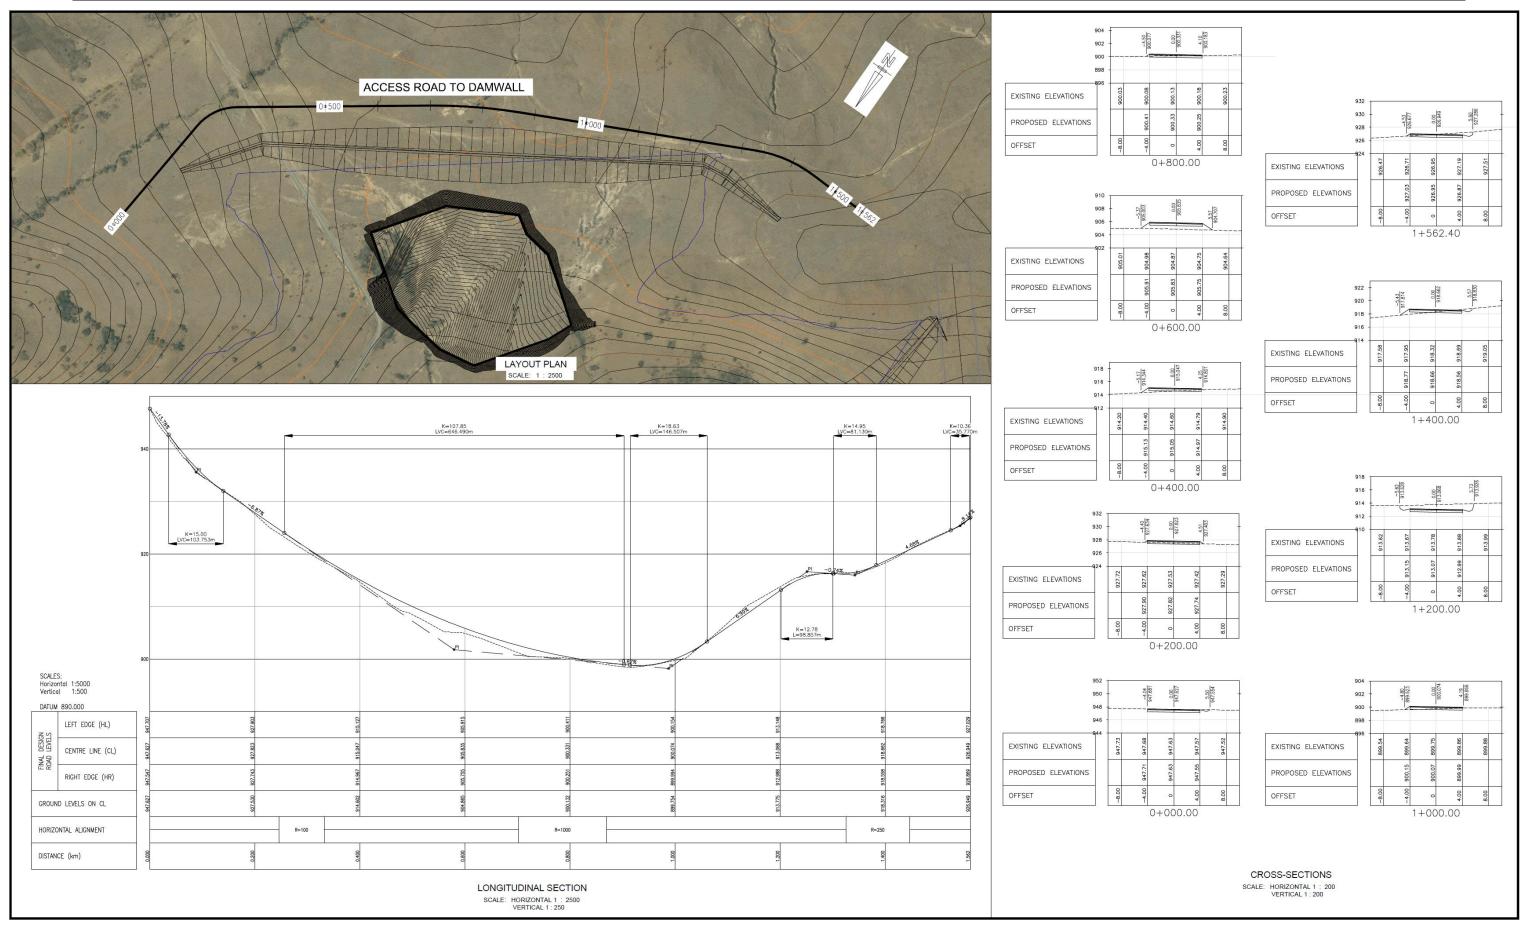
Smithfield Dam – Layout plan and longitudinal section of main access road
